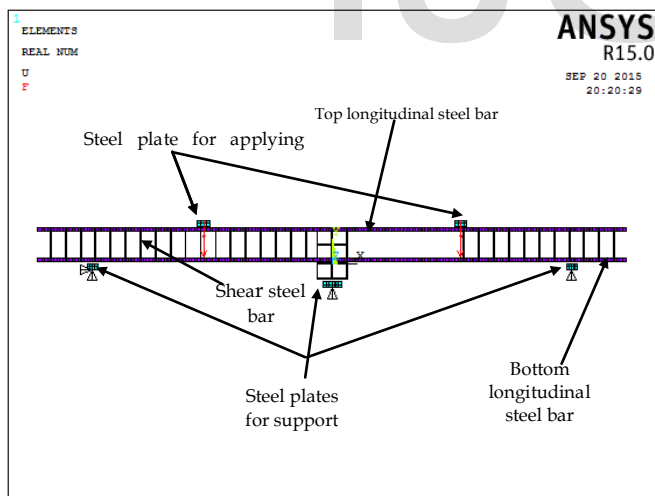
Steel Plate, Steel Support and Reinforcement Configuration for beams
